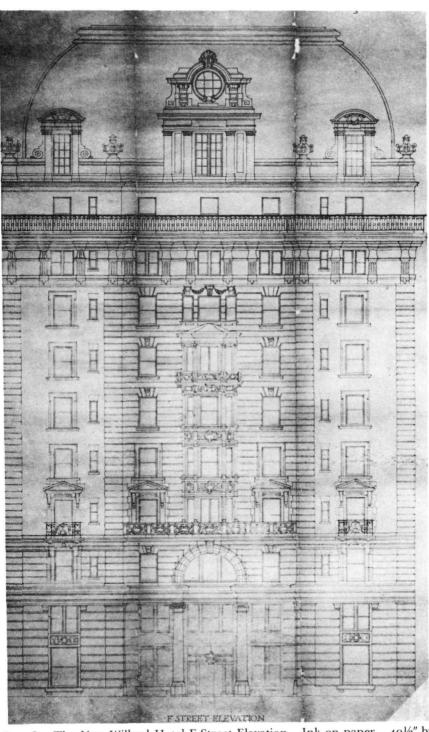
The New Willard Hotel F Street Elevation. Ink on paper.  $40\frac{1}{2}$ " by  $24\frac{3}{4}$ ". Building permit 926 of November 12, 1902.
